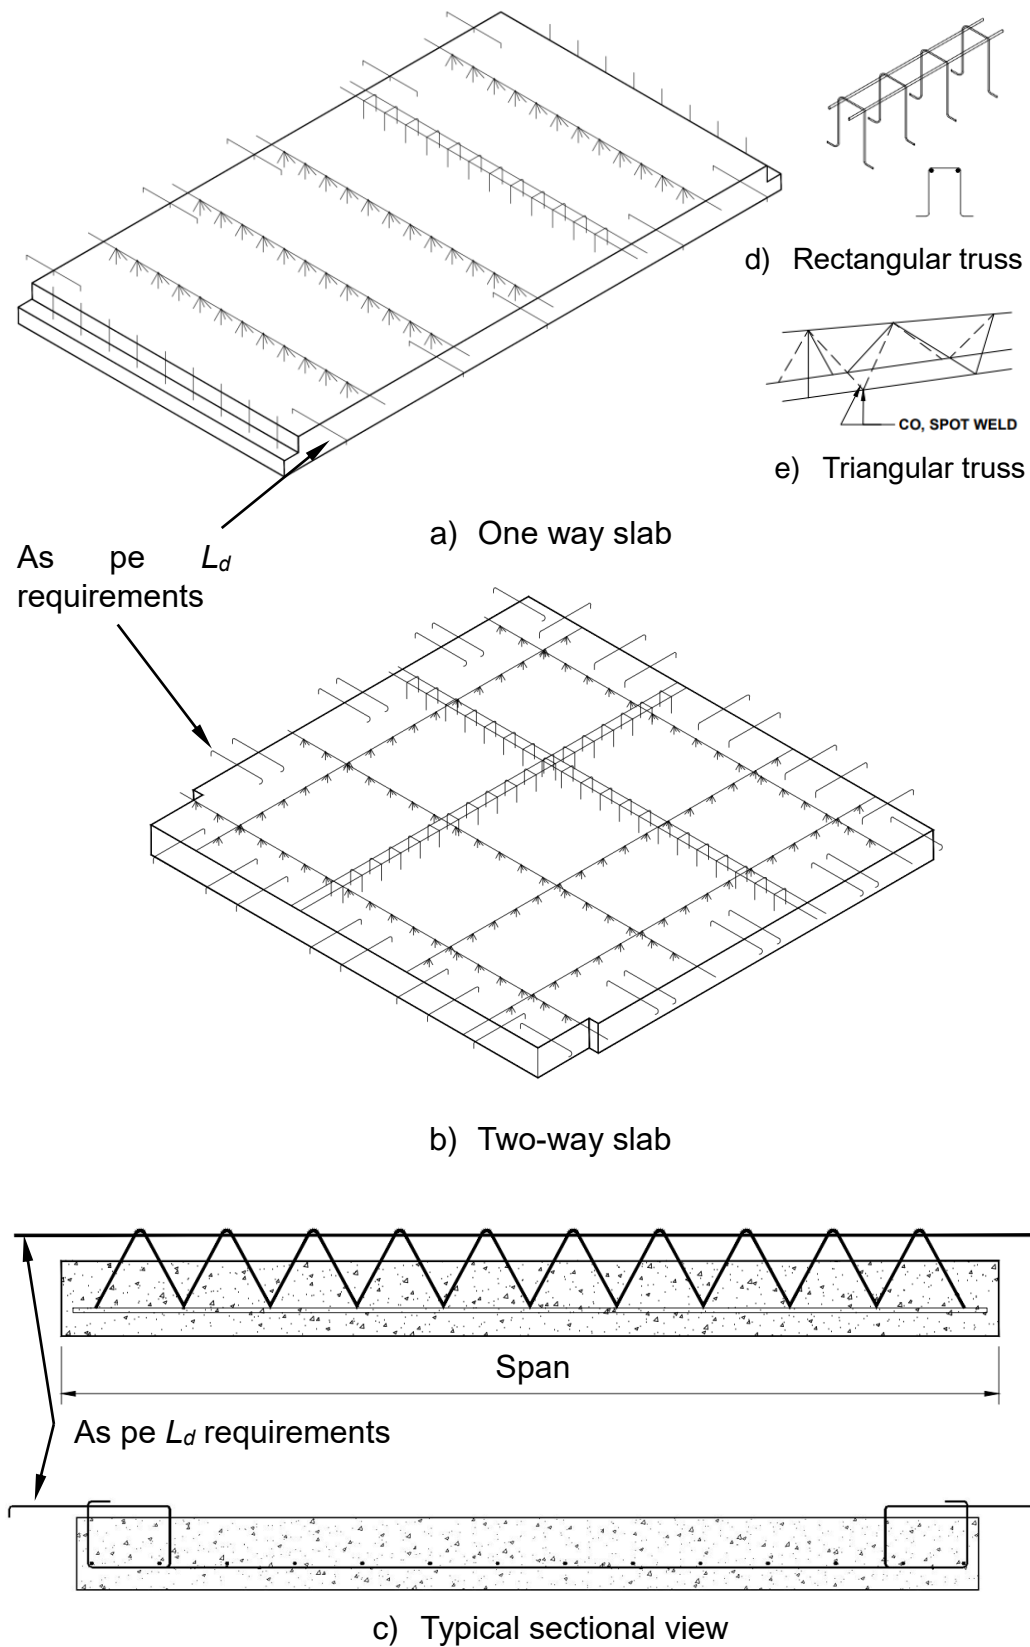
PRECAST COMPOSITE SLAB PANELS
